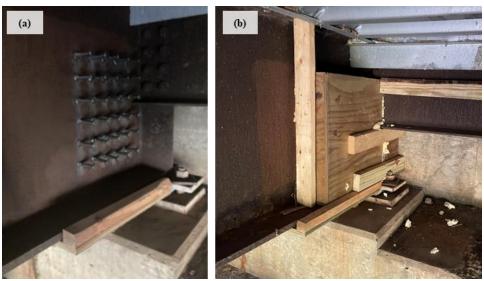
Photos of Bristow Road Bridge Repairs Before Fiber Reinforced Concrete Installation: (a) Shear Studs After Welding; (b) Formwork
